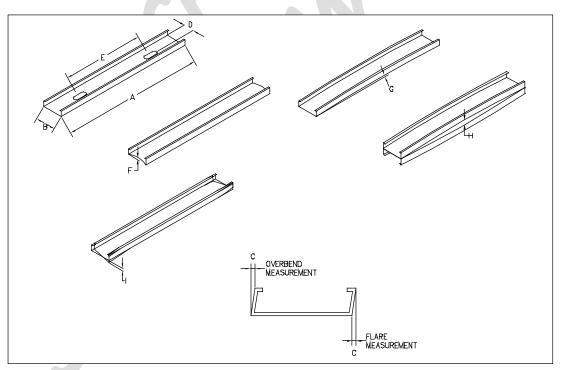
Manufacturing Tolerances for Non-Structural Members
